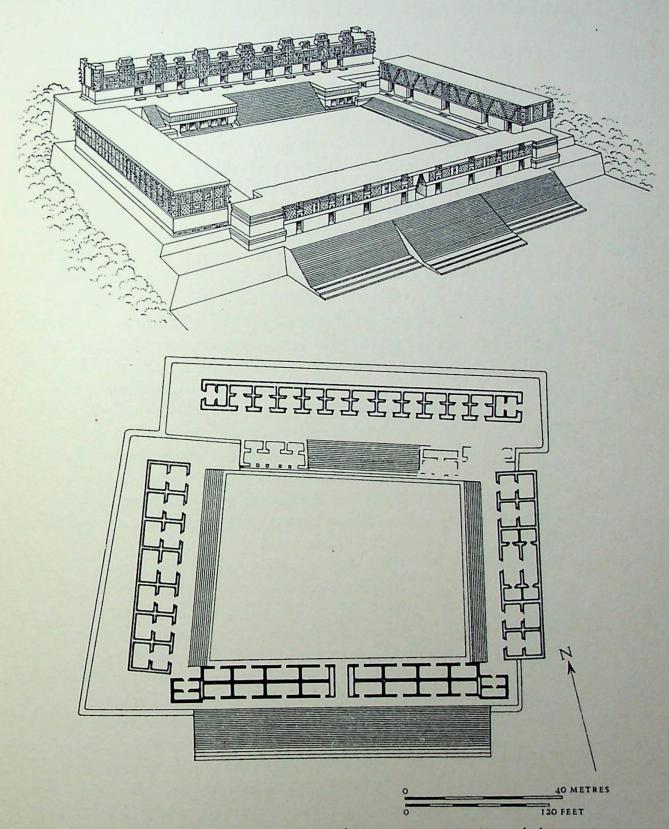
Uxmal, Nunnery, tenth century. Isometric view and plan
